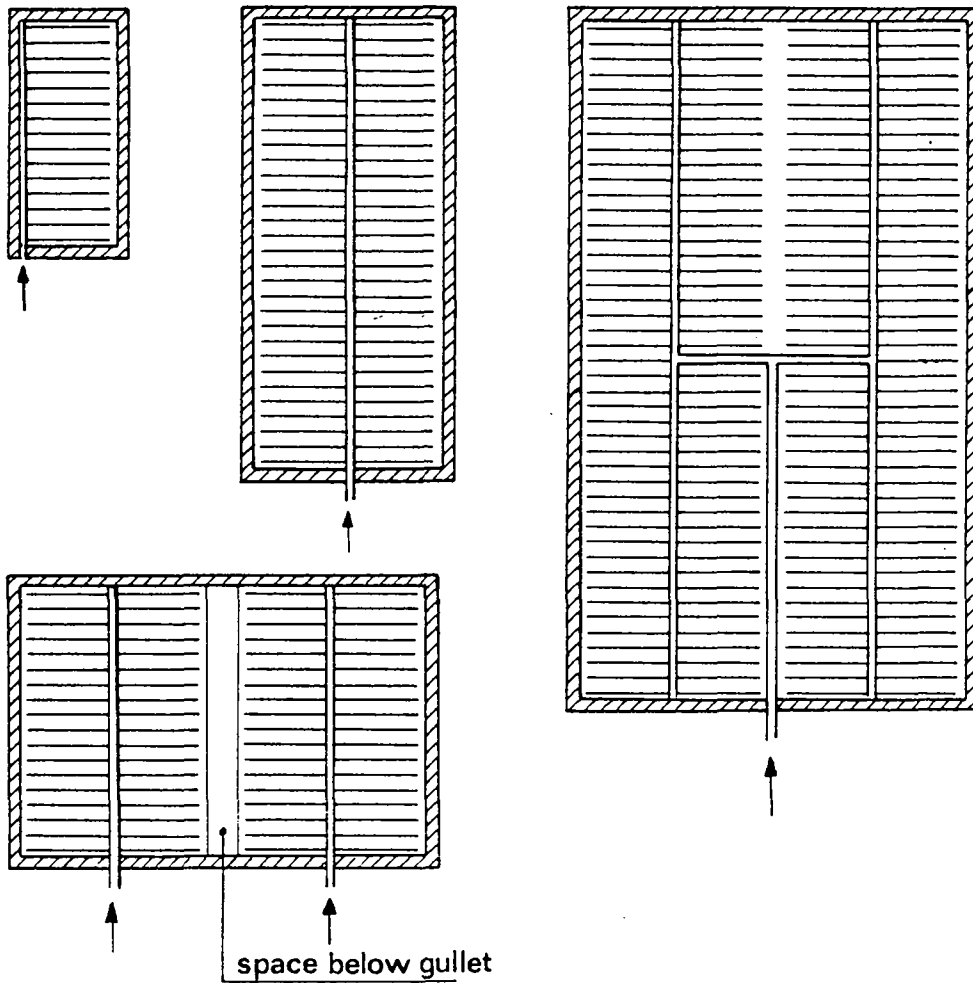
Common arrangements of perforated pipe underdrains.
